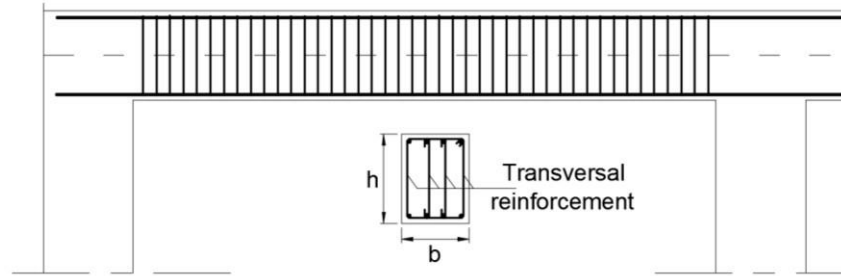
Longitudinal and transversal beam section with transversal reinforcement (Djeukoa, 2018)
